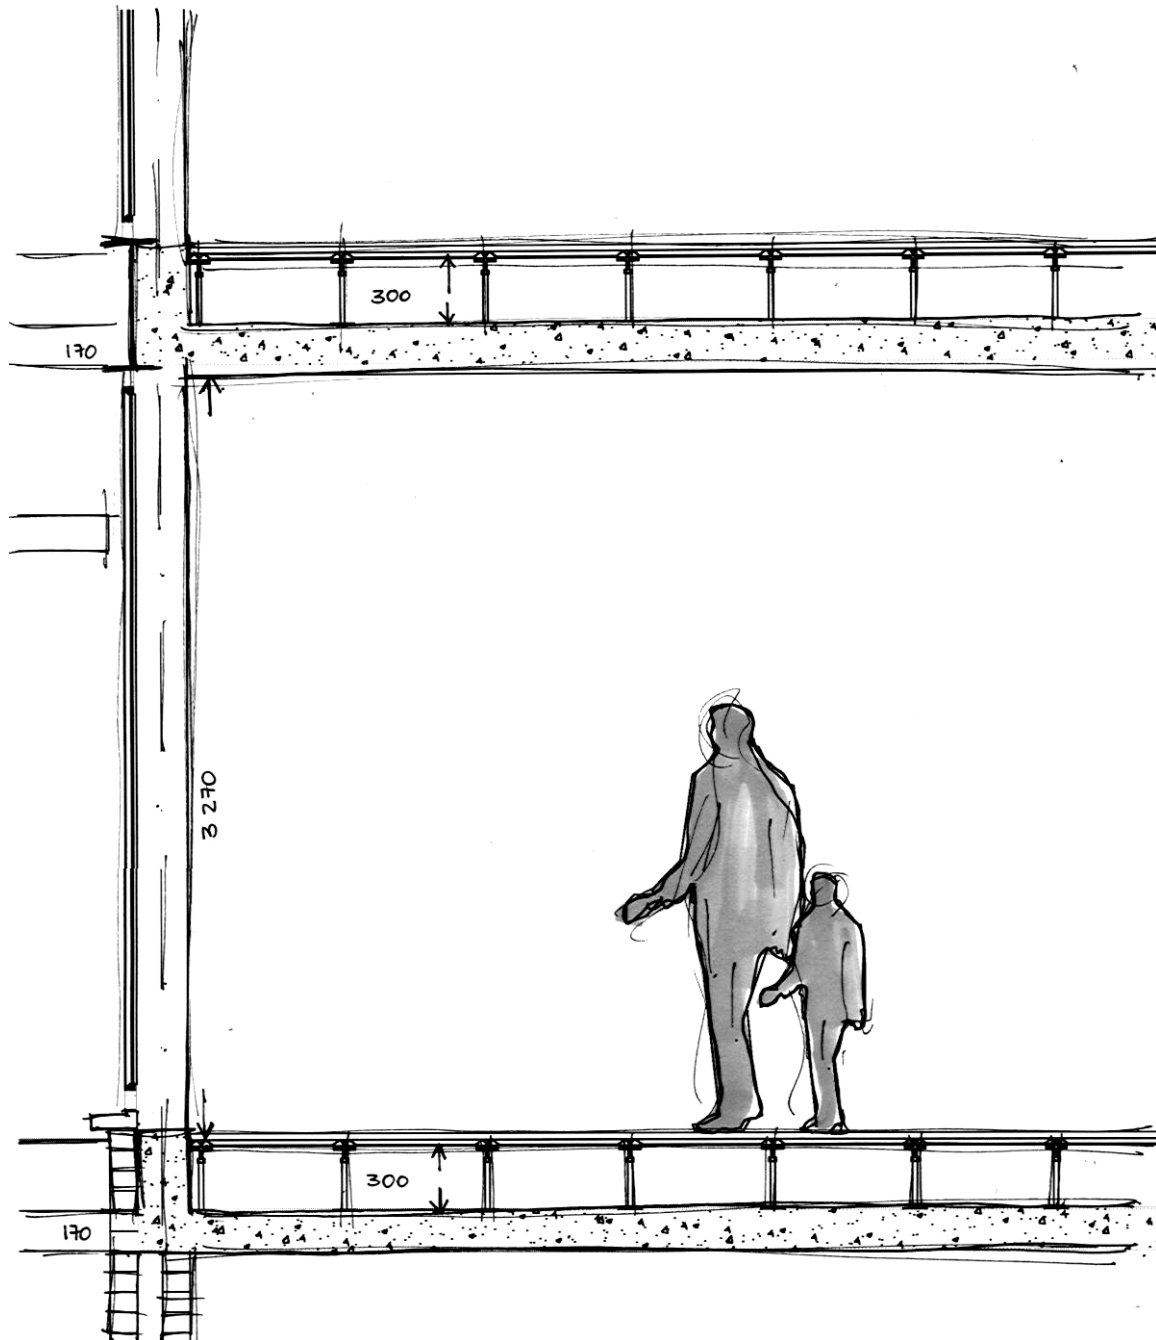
A concept section through DiD Warehouse to show floor to ceiling heights and access floors.
